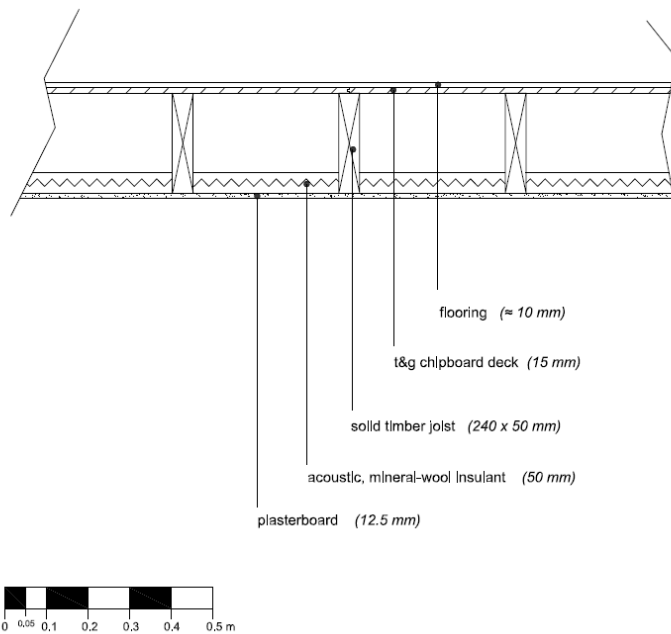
Intermediate floor TF (timber frame, constructed in situ), cross-section.
